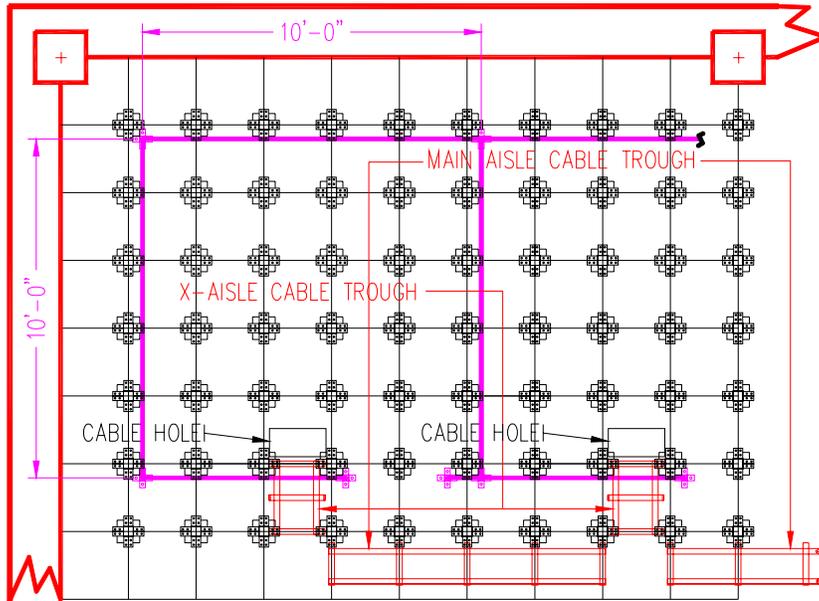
TYPICAL RAISED FLOOR CAGED COLLOCATION
